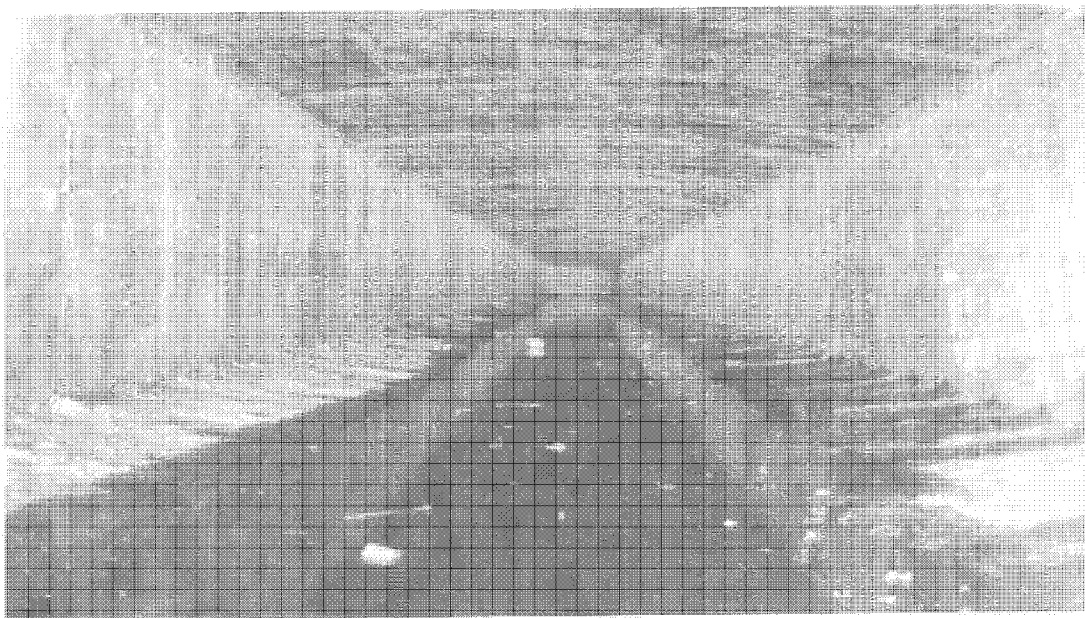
Interior of As-built Closed Conduit "B," 29 April 1938.
